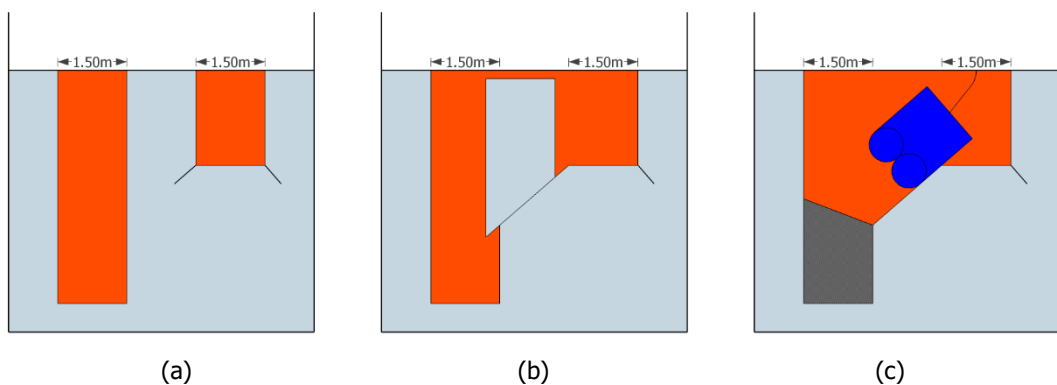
Inducing controlled failure of pillar into non-active trench. (a) Original situation: completed trench on the left, cutting occurs in shallower trench on the right, (b) potential planar failure of the pillar in between trenches, (c) cutter in right trench diverting into left trench due to absence of equal confinement
